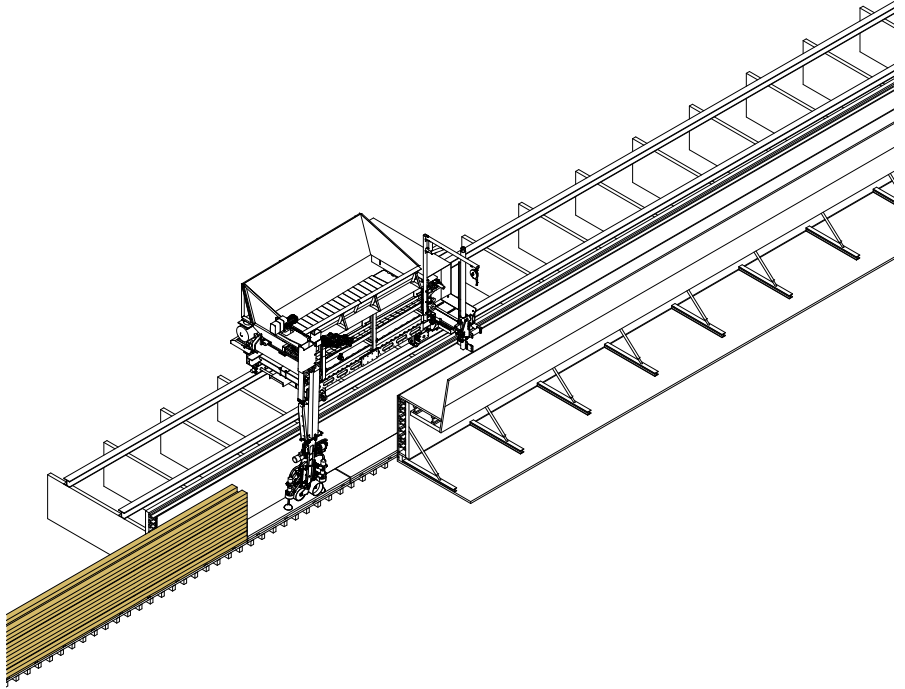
Ramming Machine ,Roberta' with endless mould (50m)
